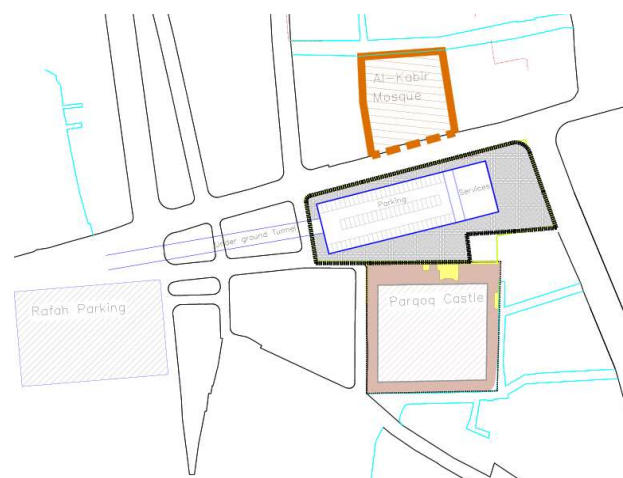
Proposed plan of Safe Underground Shelter in Khan Younis city center, source: Authors
